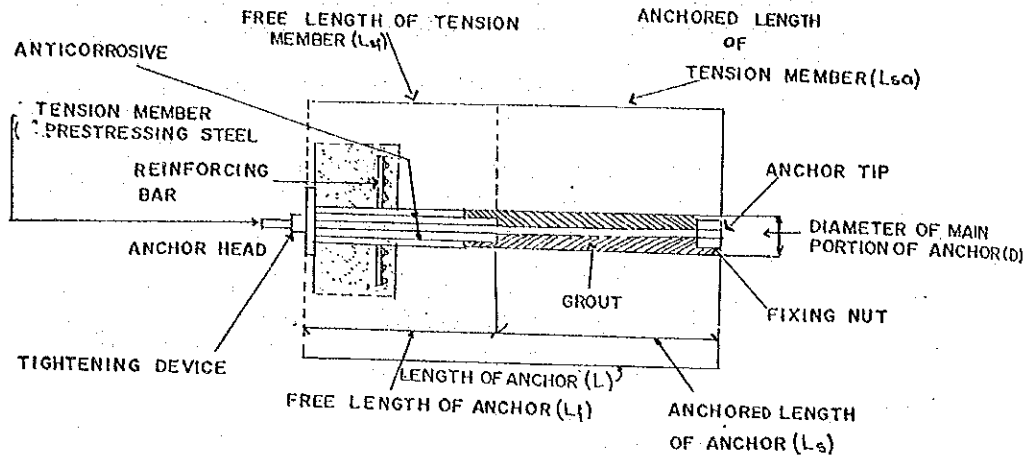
STRUCTURAL DETAIL OF ANCHORING MEMBER
